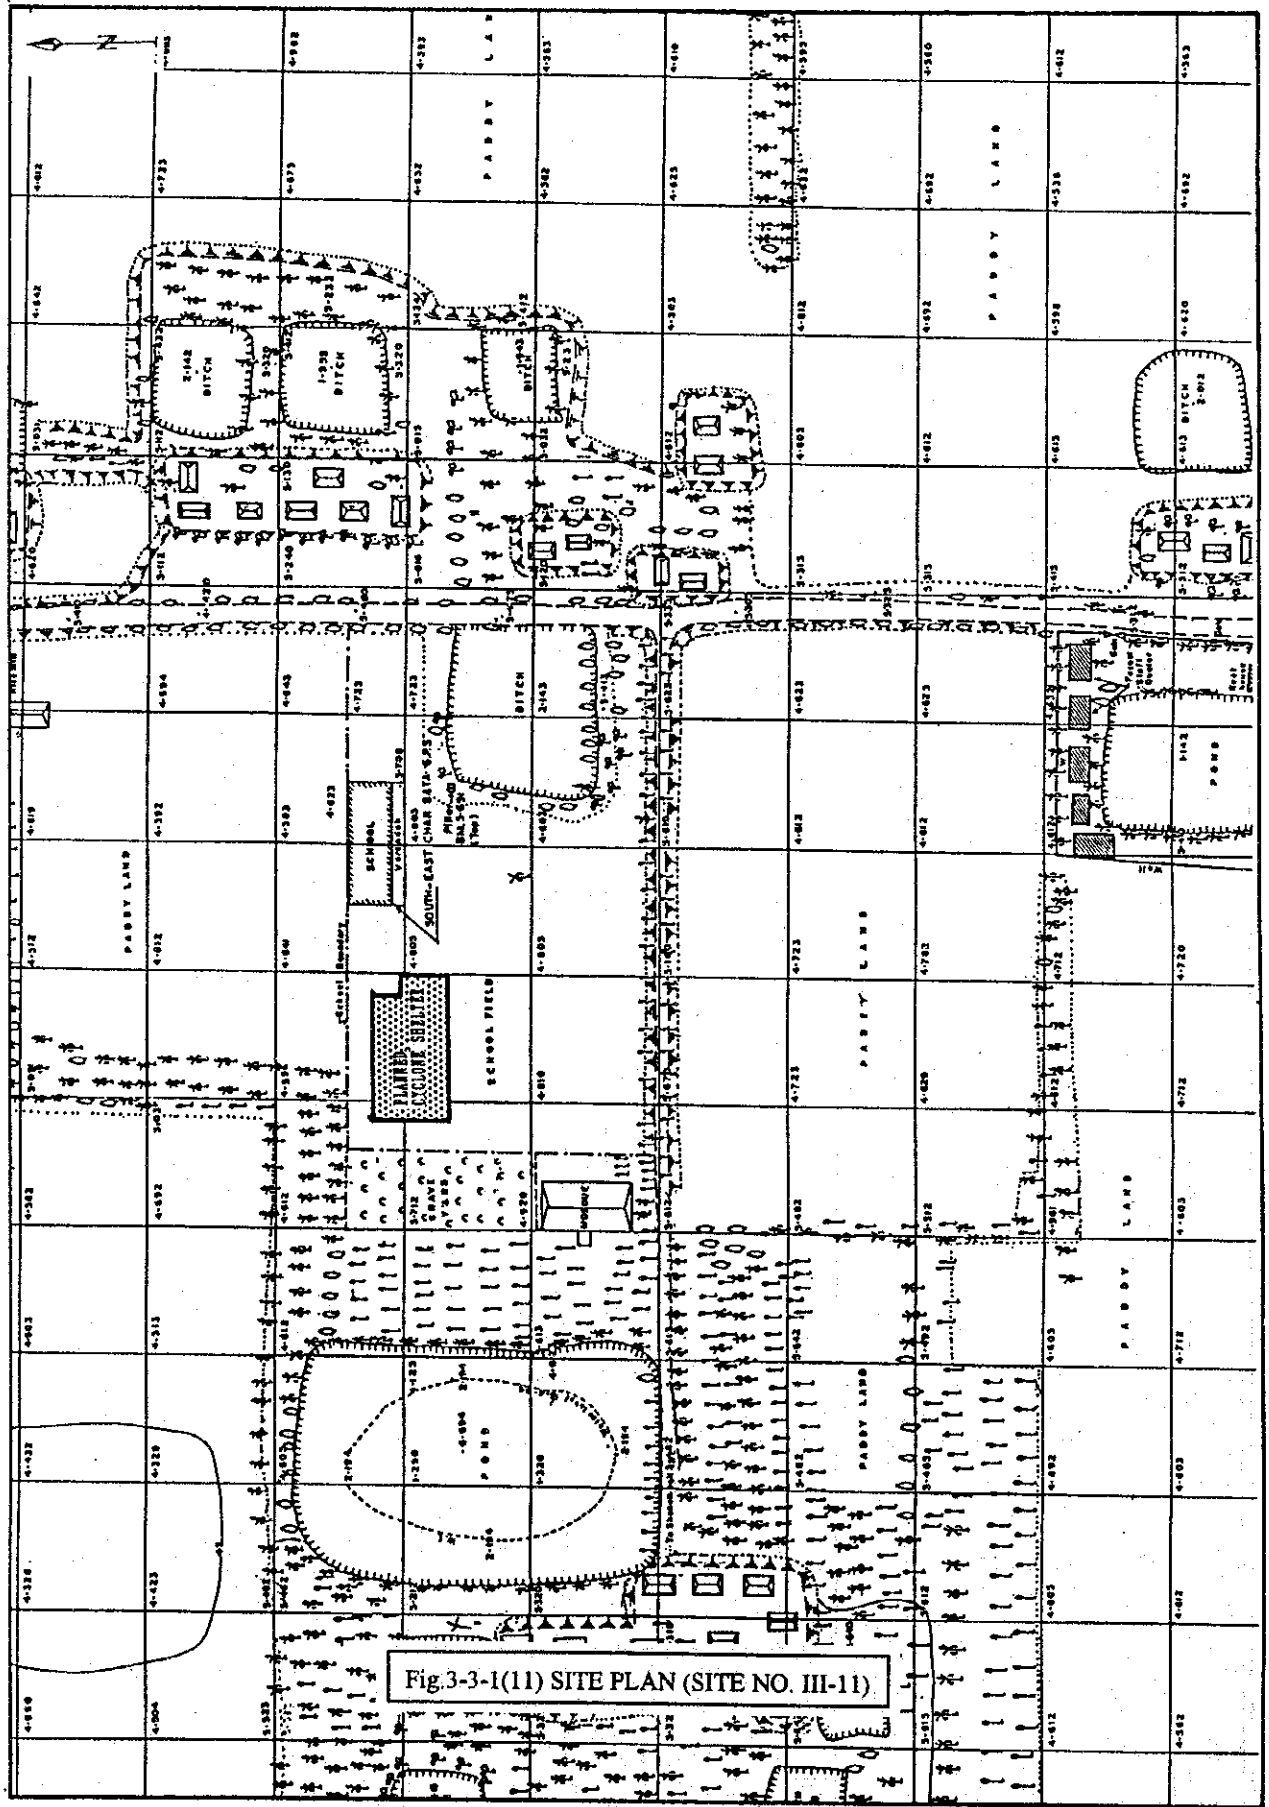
(11) SITE PLAN (SITE NO. III-11)
